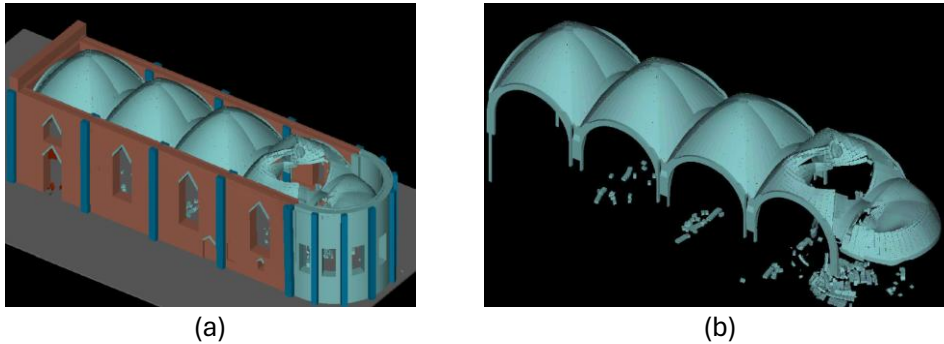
Damage configuration after the application of one accelerogram: whole structure (a) and vaults detail (b) at Level 3 of Church 1
